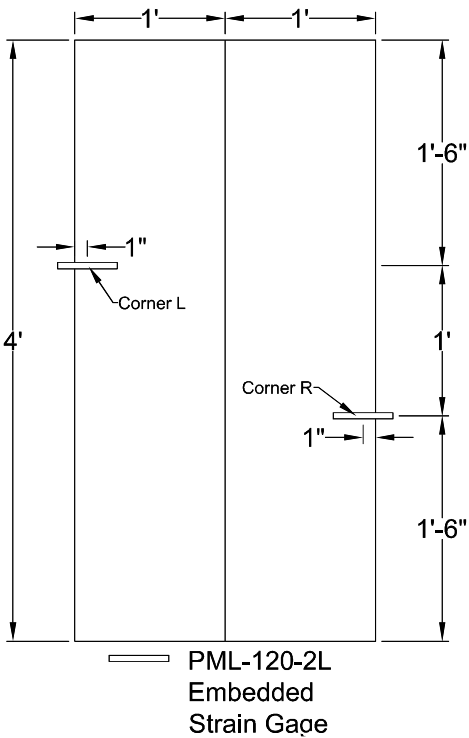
Plan View of Strain Gages 19 in. Above Bottom of Precast (All Specimens)
